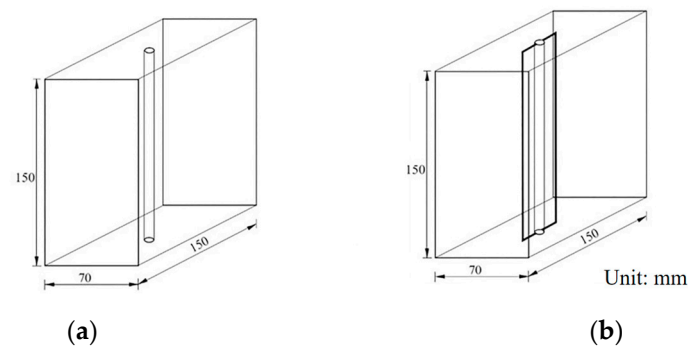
Concrete test specimens. (a) Specimen BI. (b) Specimen BII.
